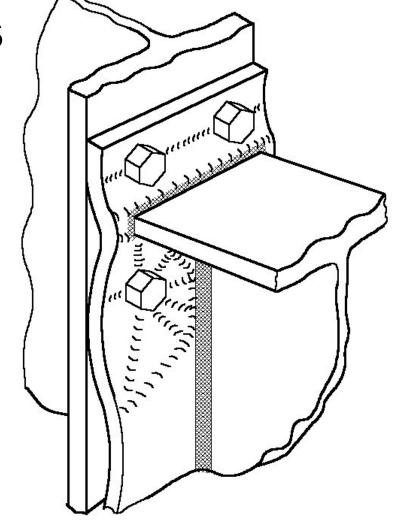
Controlled yielding of end plate protects brittle components (bolts & welds) from overloading
